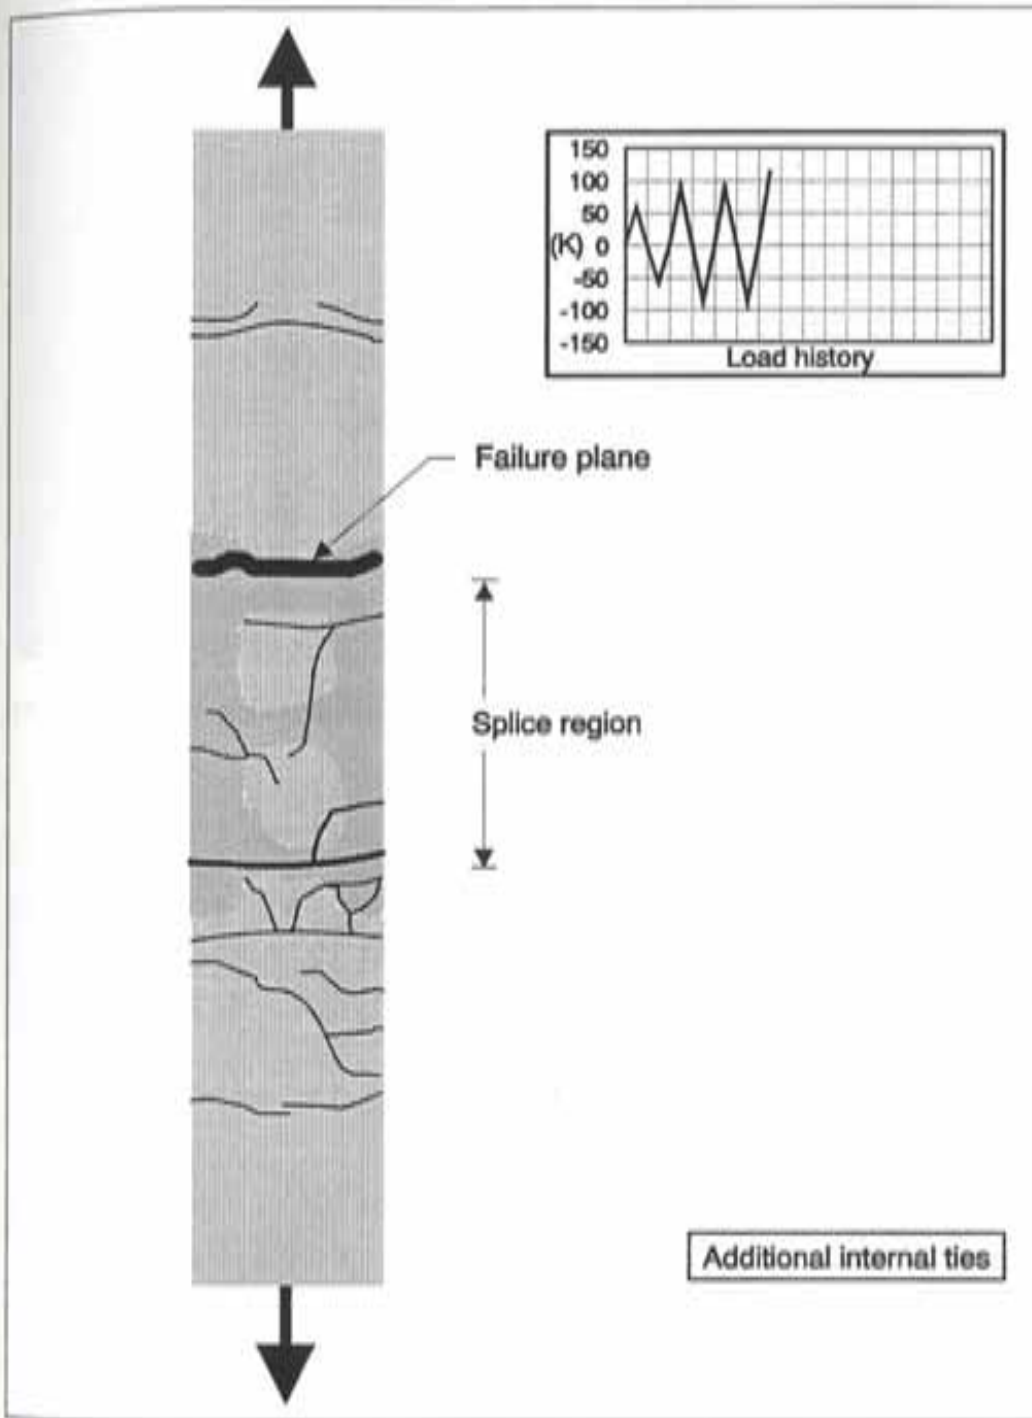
Crack pattern in specimen U-AT8-1 at failure
